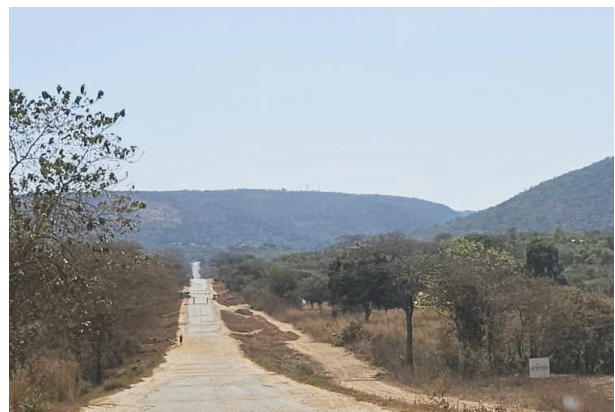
Embankment of bridge/culvert in poor state in Petauke (Mwanjabantu area)
